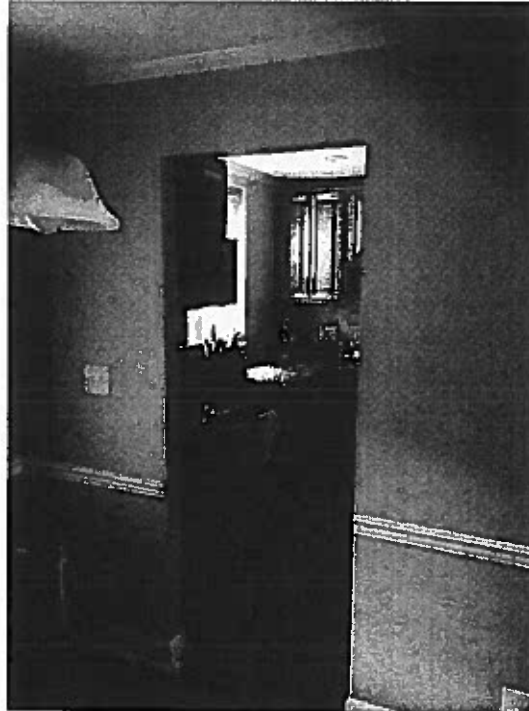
Interior Partition Wall - Segment 1 – to be Removed
